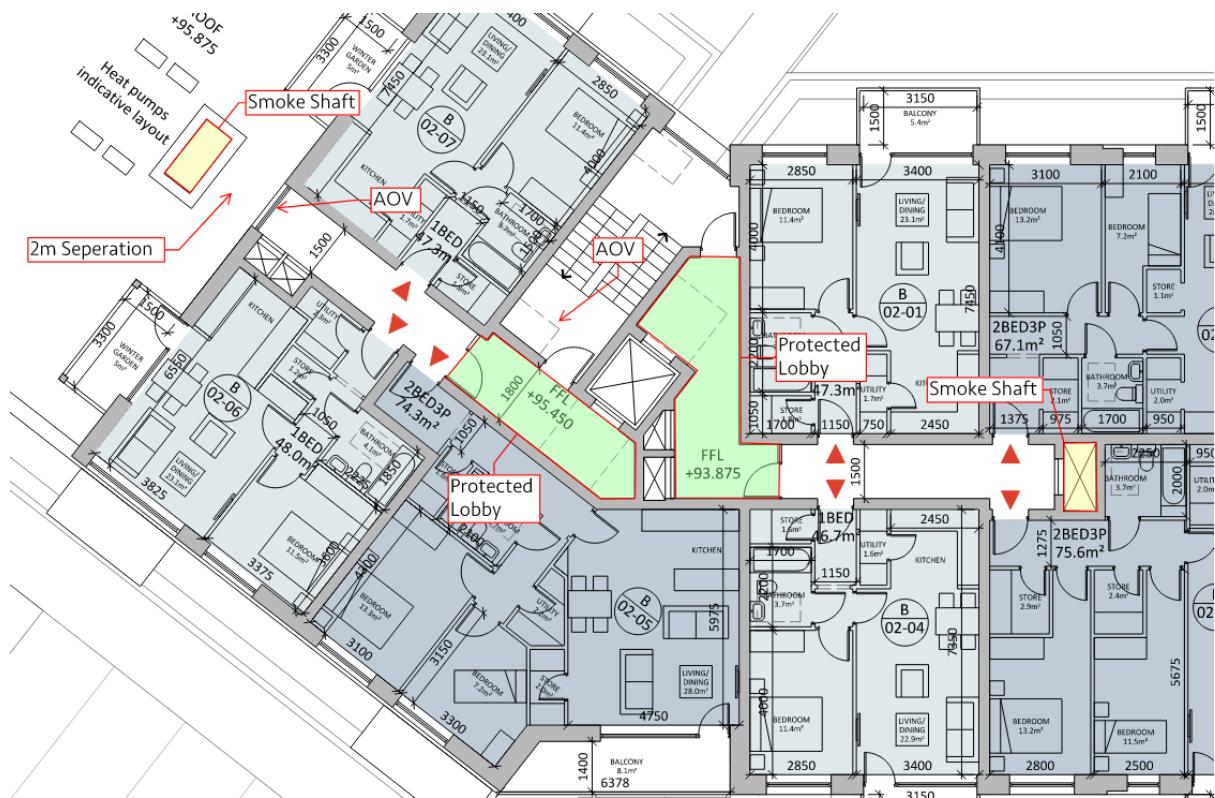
First floor layout showing smoke shafts and protected lobby to stairway.
